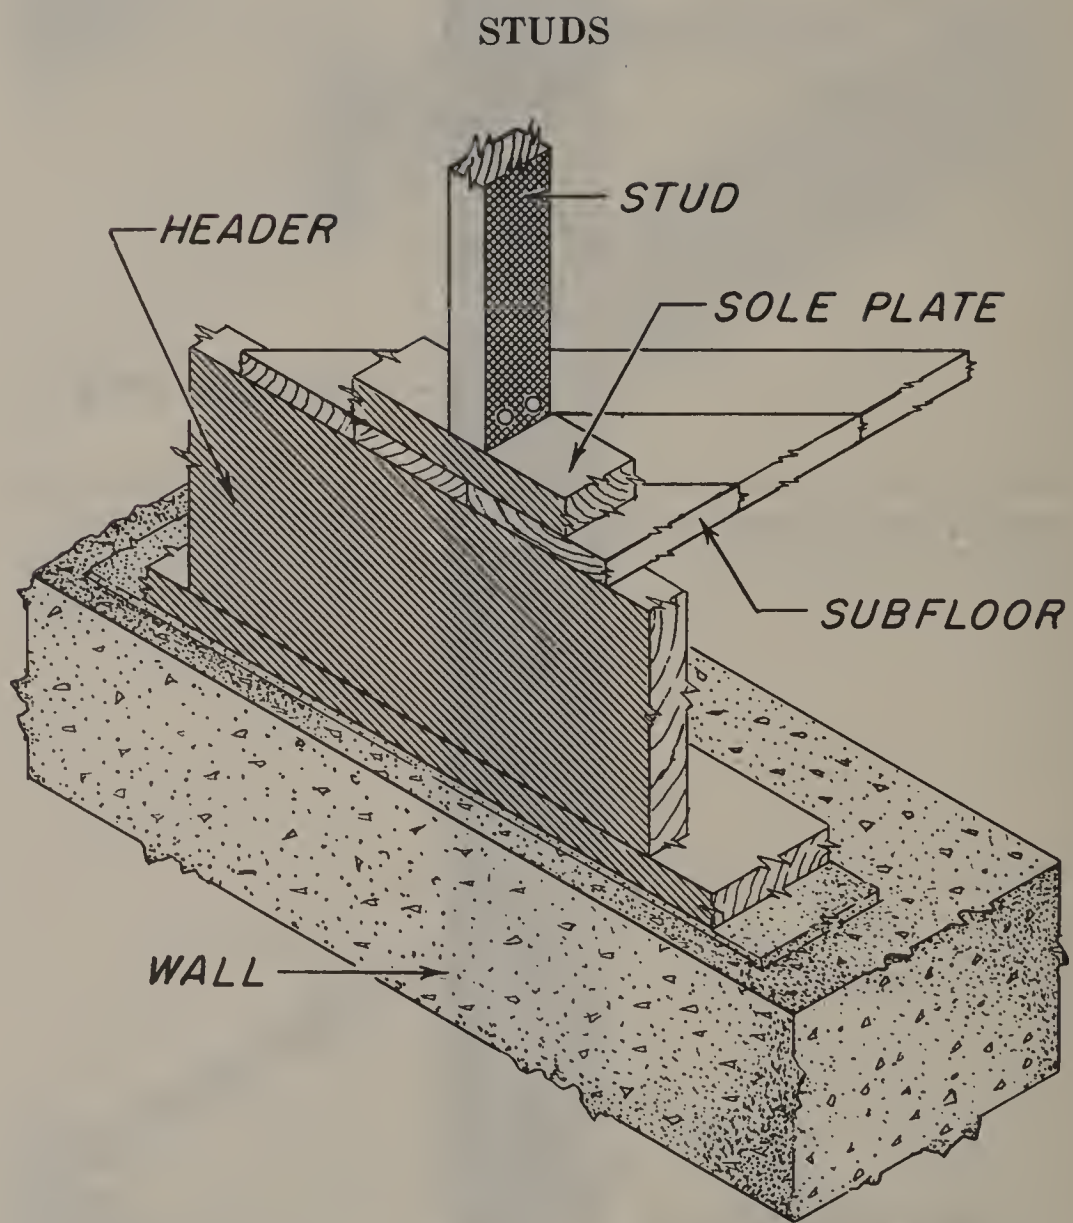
Studs. Toenailed to sole plate with two eightpenny nails on each wide face. Note: One nail on each wide face is sufficient if diagonal boards or plywood is used as sheathing as shown in figure 32 or figure 34.
